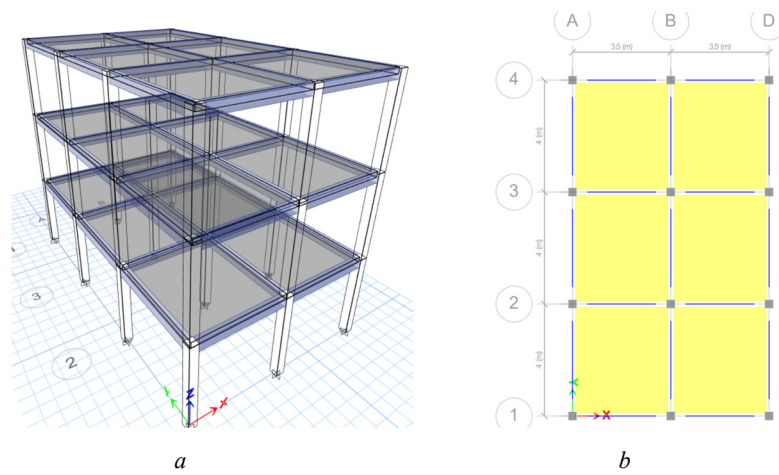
Proposed model: *a* — 3D view; *b* — Plan
